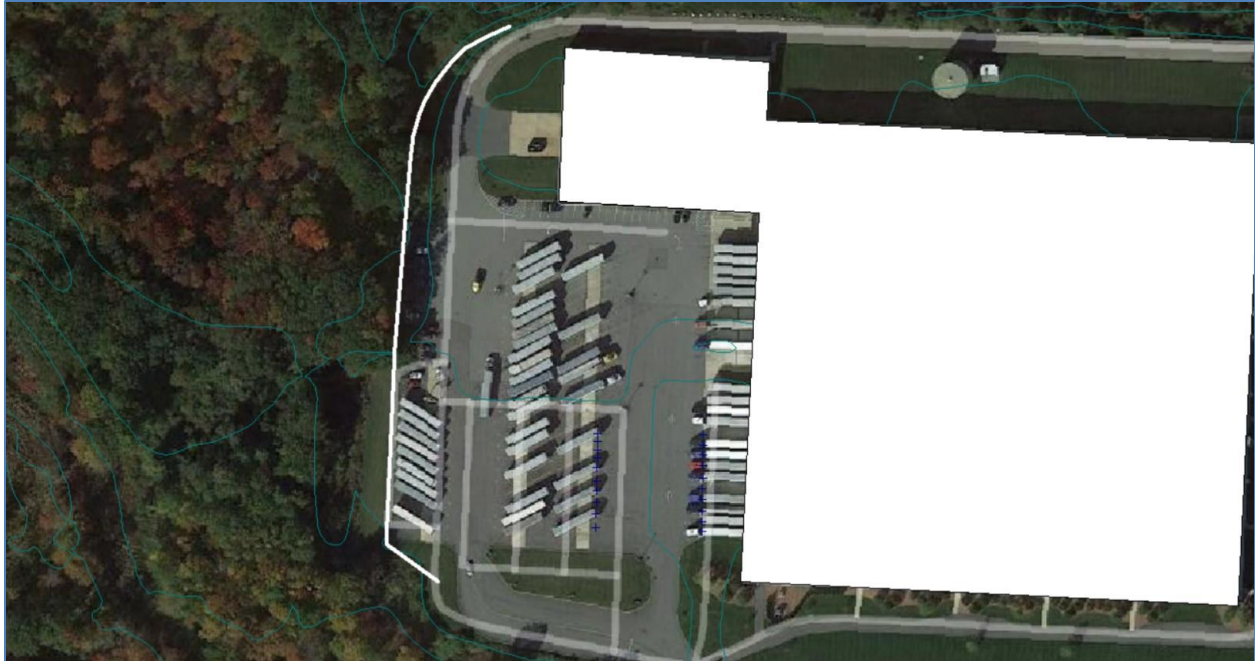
Shortened Perimeter Parking Lot Noise Barrier Option
